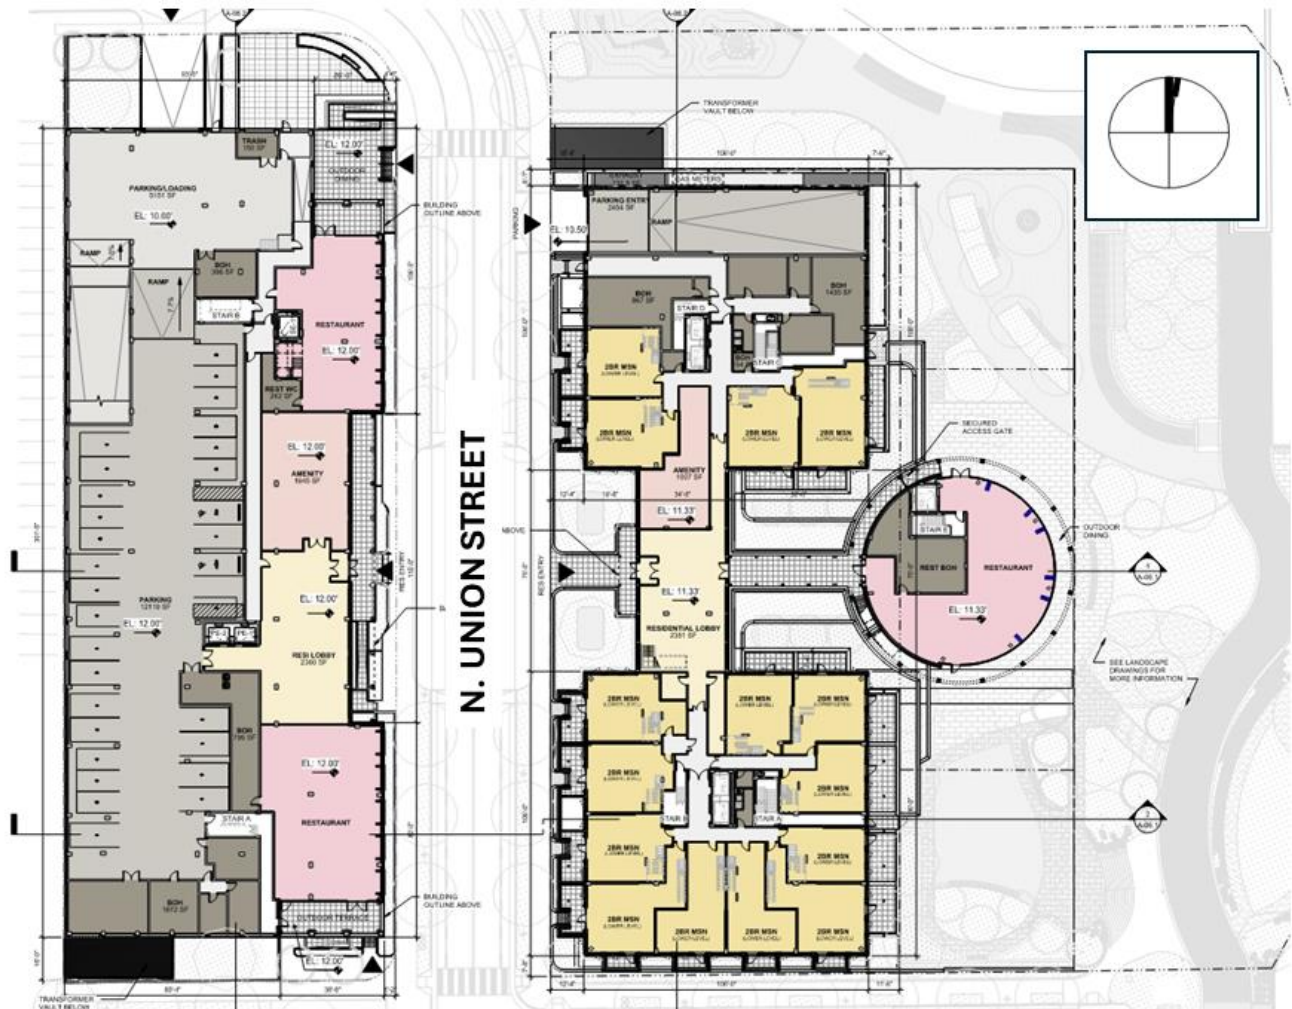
First-floor site plan for each building. Note the retail/restaurant spaces are in pink.
